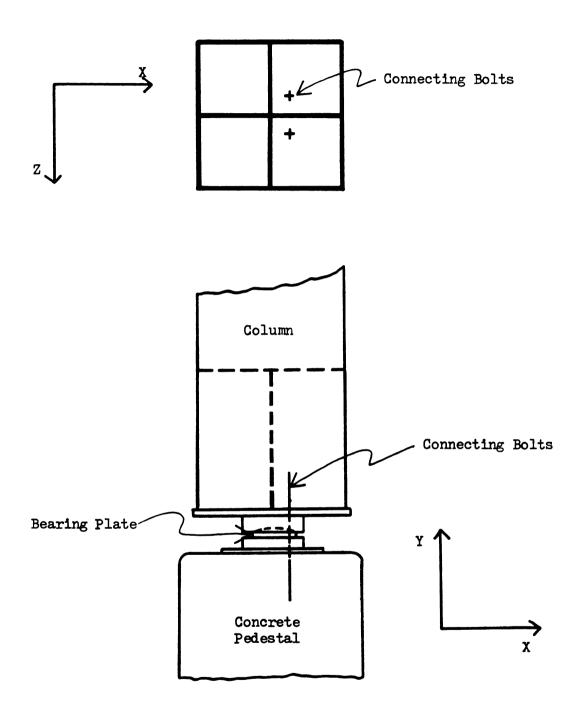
CSCB Column Cross-section and Pedestal Connections
